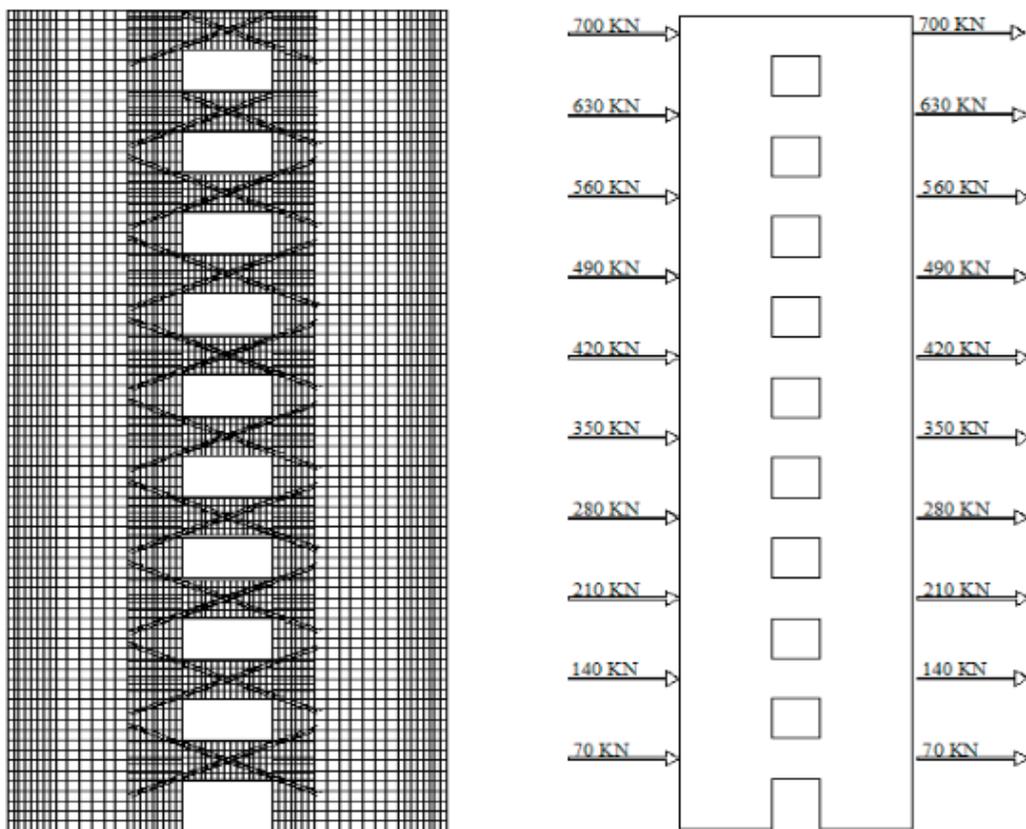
Geometry of coupled shear wall and lateral forces imposed on the structure
